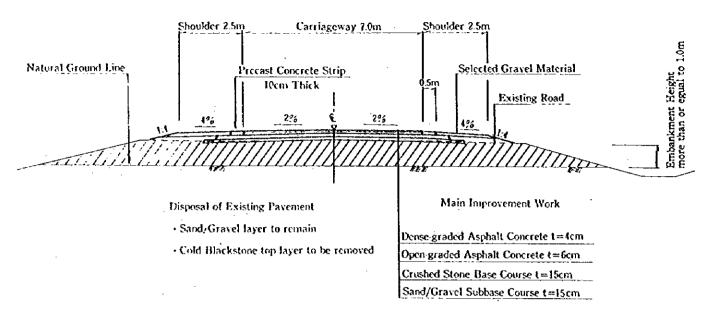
Cross-Section of Road for Type-IV Improvement
